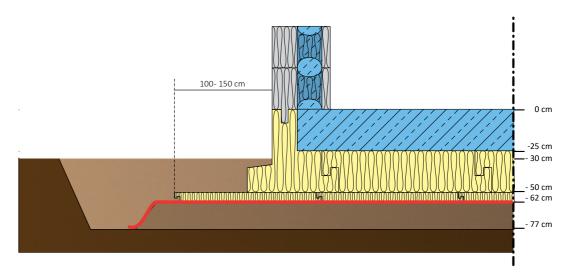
Schematic construction of the slab foundation using additional thermal insulation.
